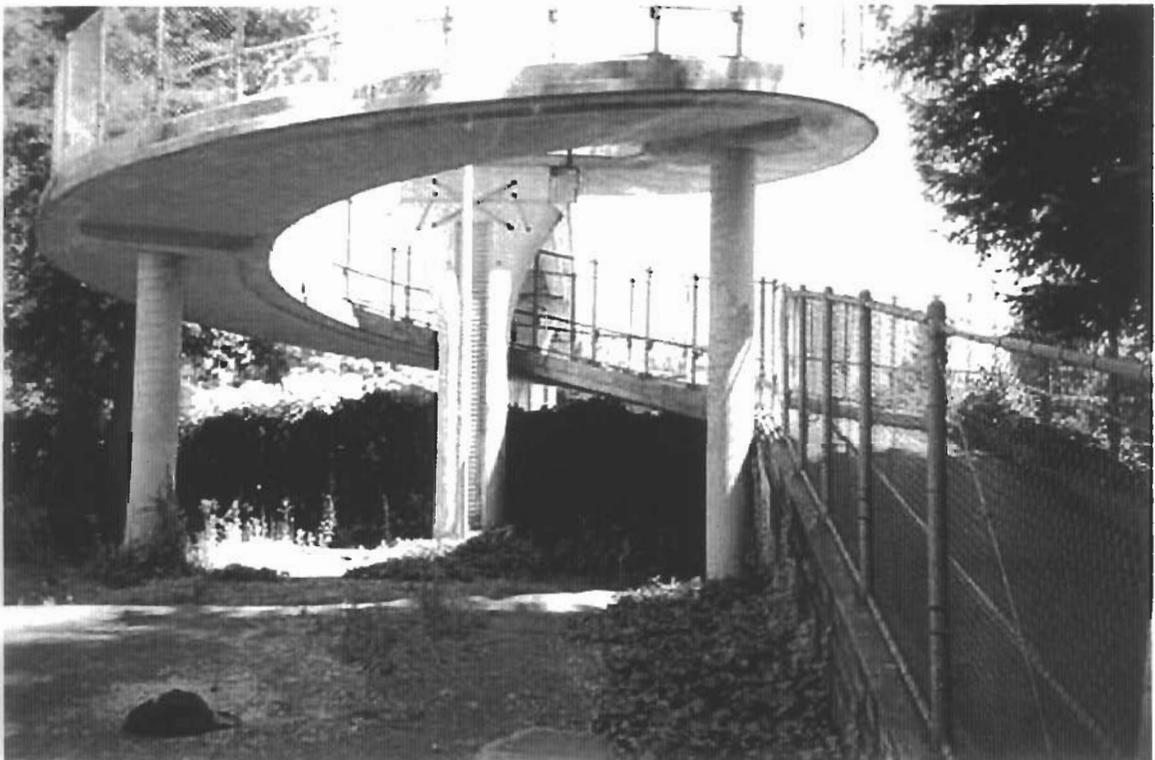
Santa Rosa Creek pedestrian walk –west side.
